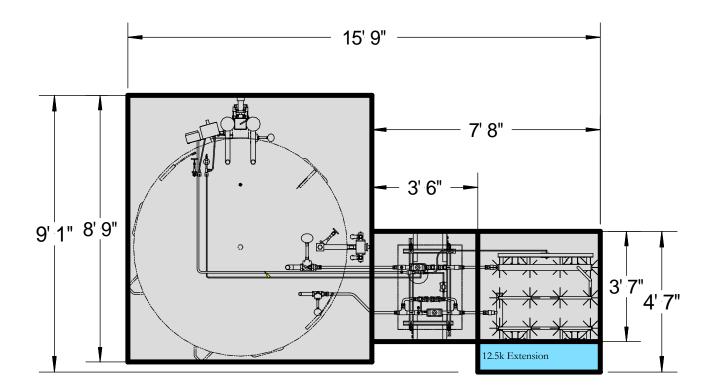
Typical Layout – 3000-gallon tank with piping and control module and 7.5k HP² multi-function vaporizer (note 12.5k HP² vaporizer requires additional space)
